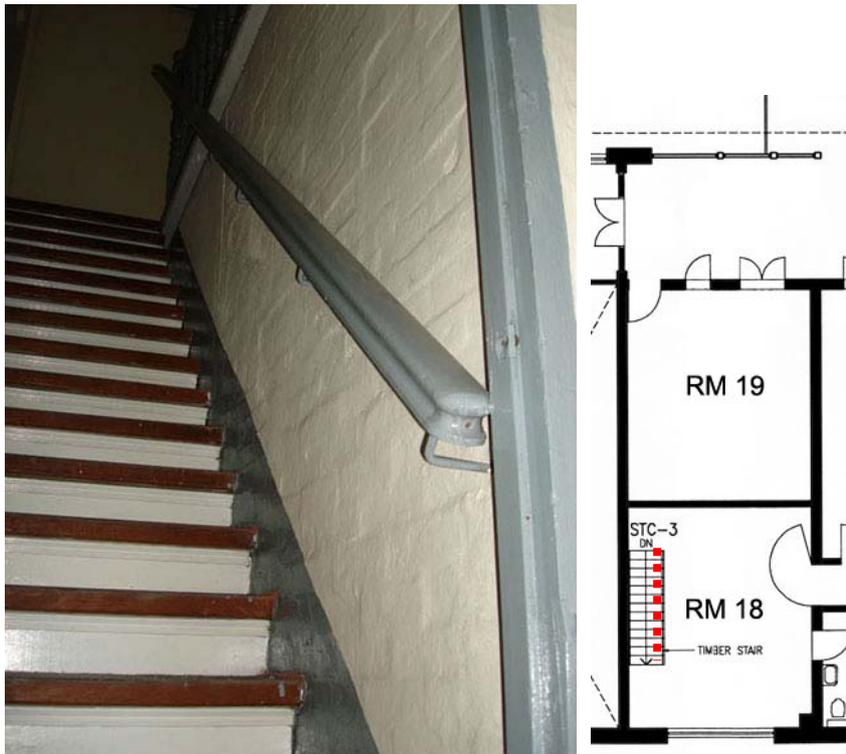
Handrail of the timber staircase (STC – 3) at the main building.
